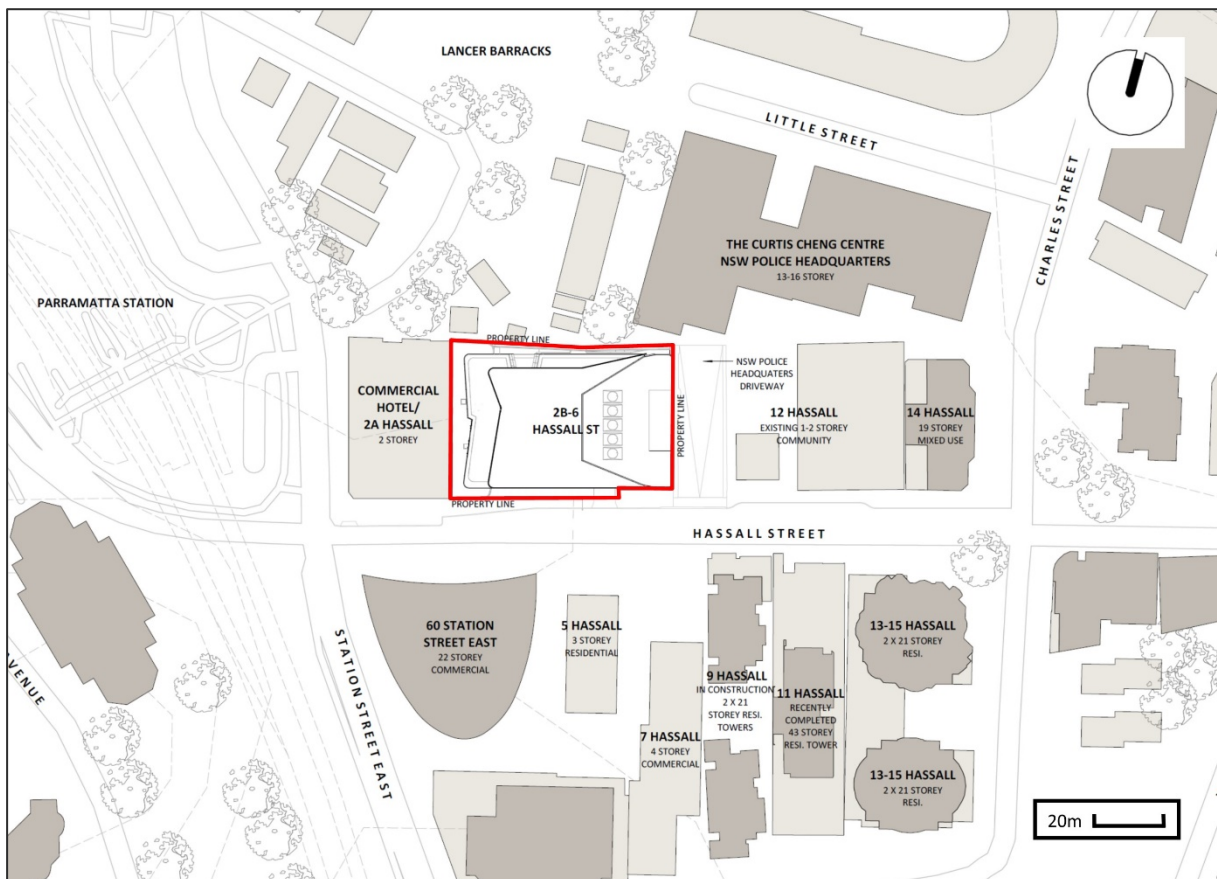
| Site Plan (Source: RtS Supplementary Information)
